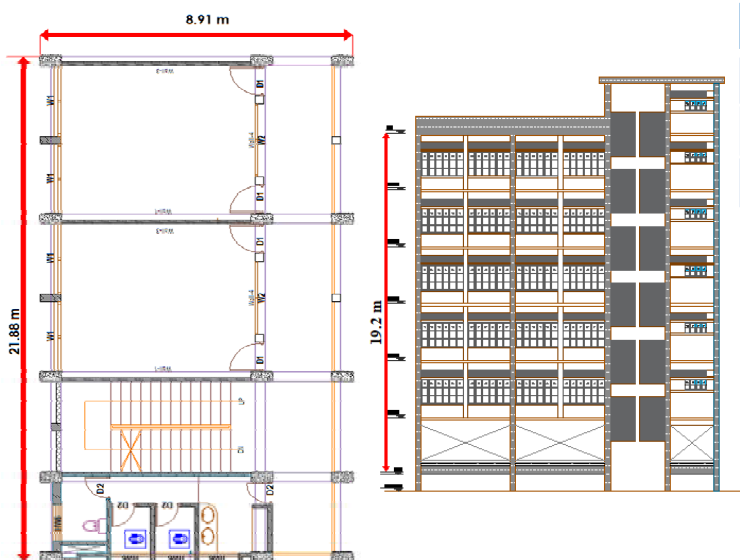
Typical floor plan and elevation of the school building investigated in this study
